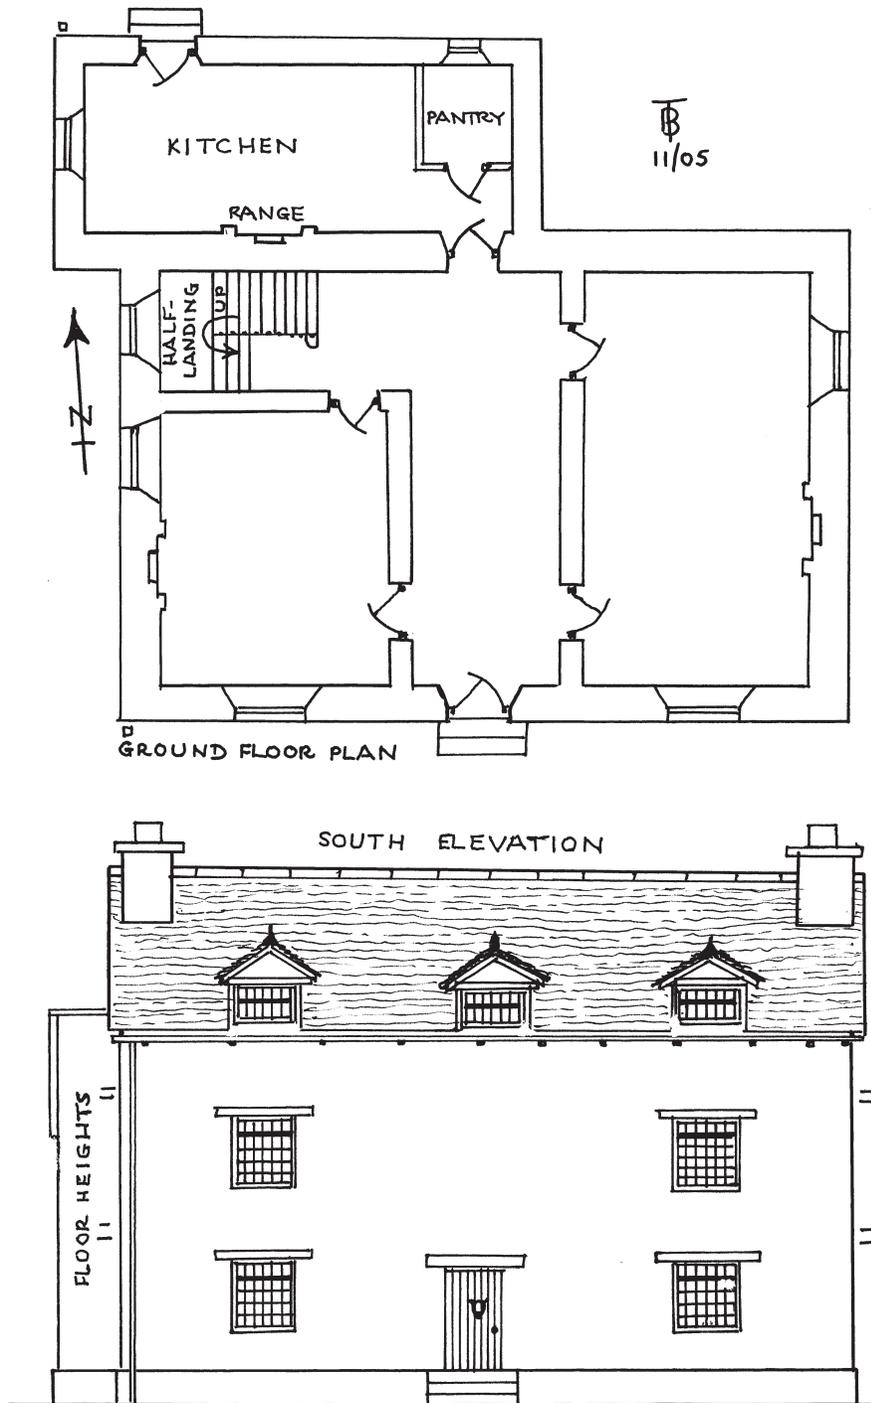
Reconstructions of the layout and appearance of Undermillbeck Workhouse based on the Ordnance Survey plan (1858), details in the carpenter's contract and building accounts and on structural considerations.
